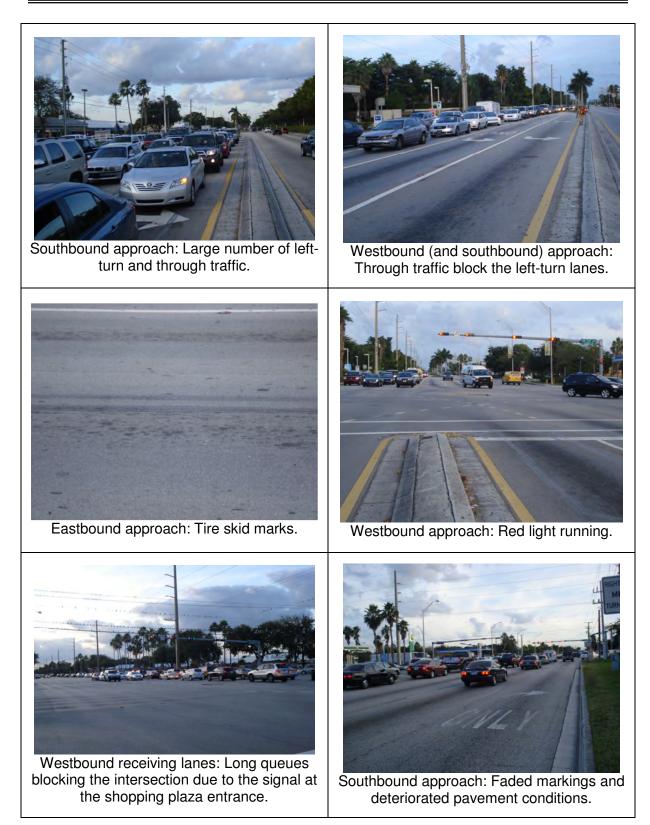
Field Review – SW 137 Avenue and SW 152 Street
